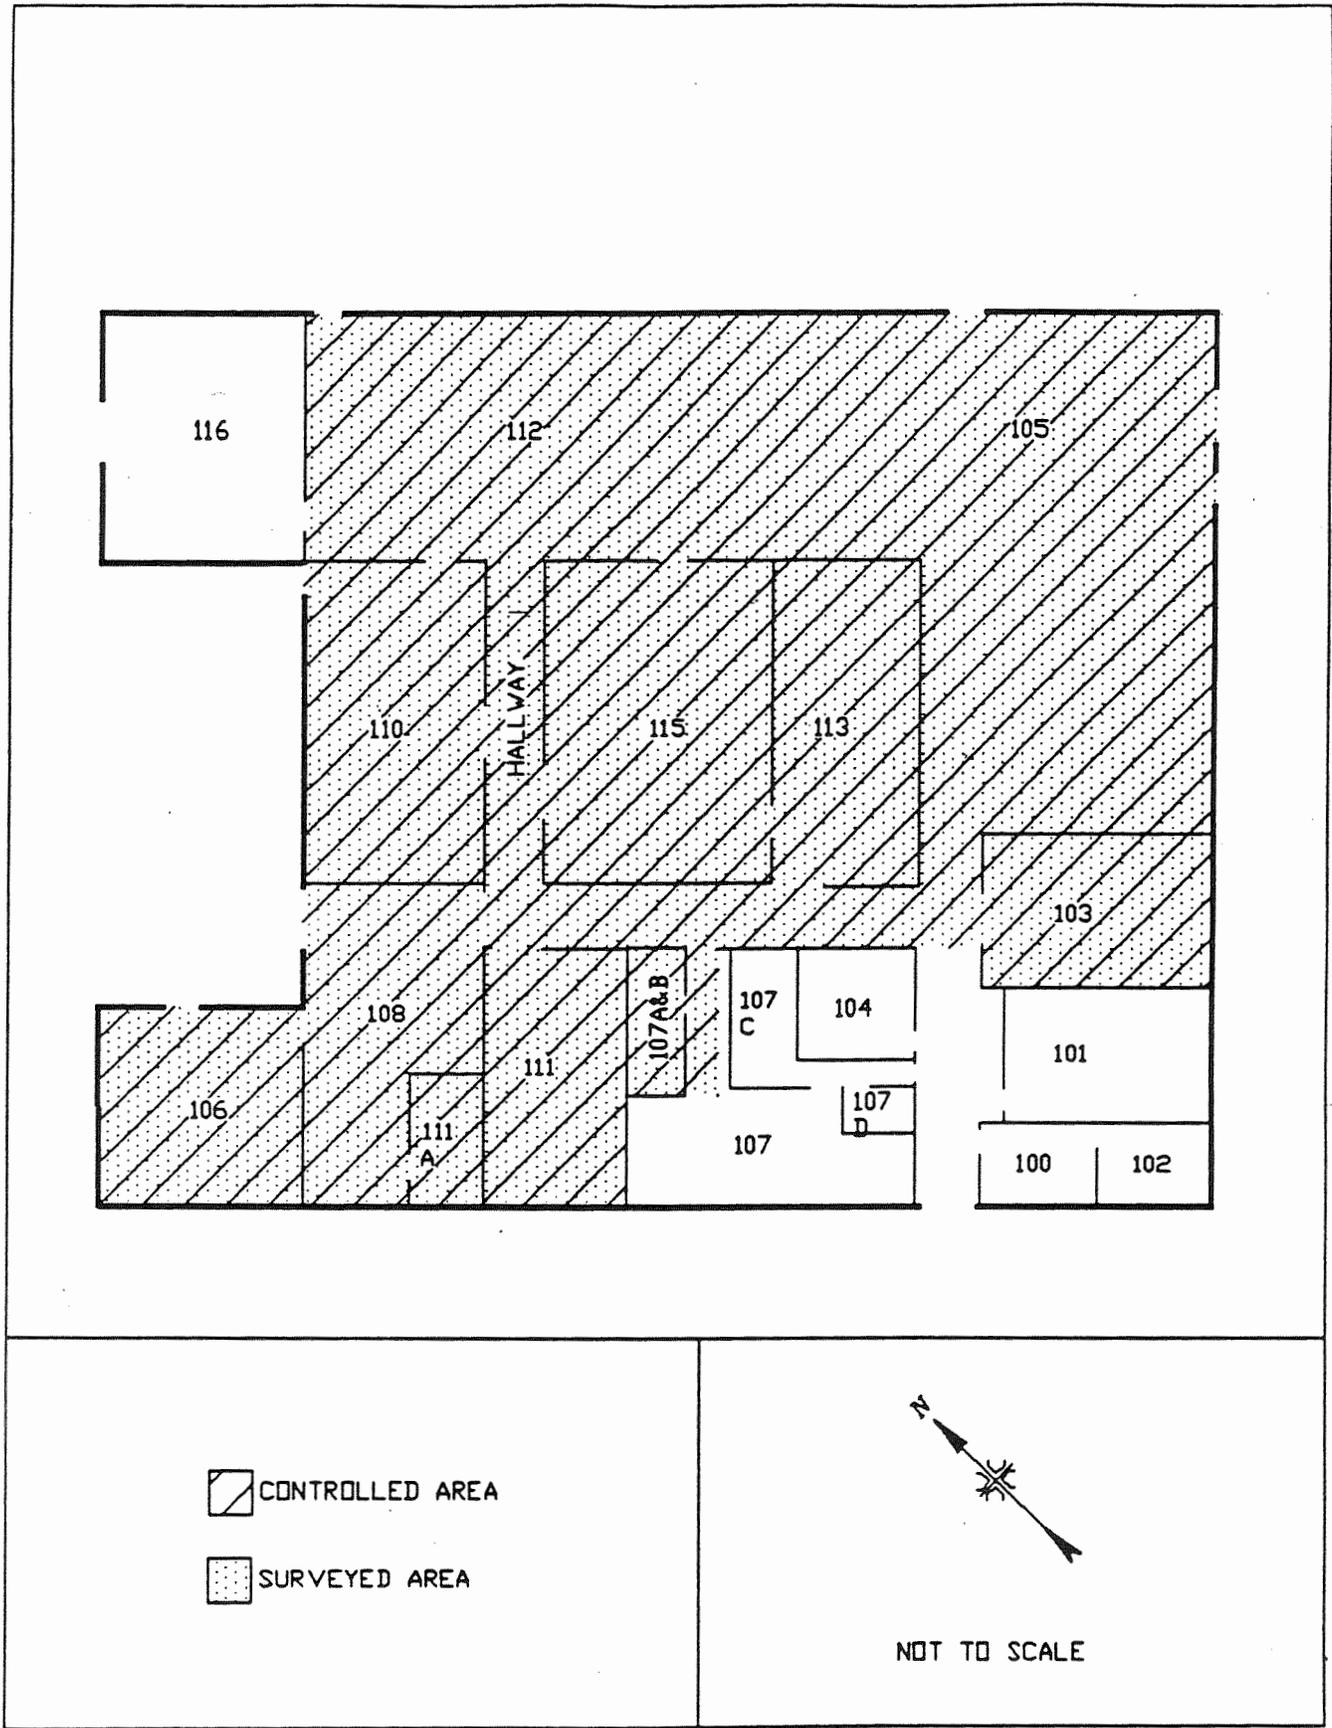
Building 005 - Floor Plan, Controlled Area, and Surveyed Areas
